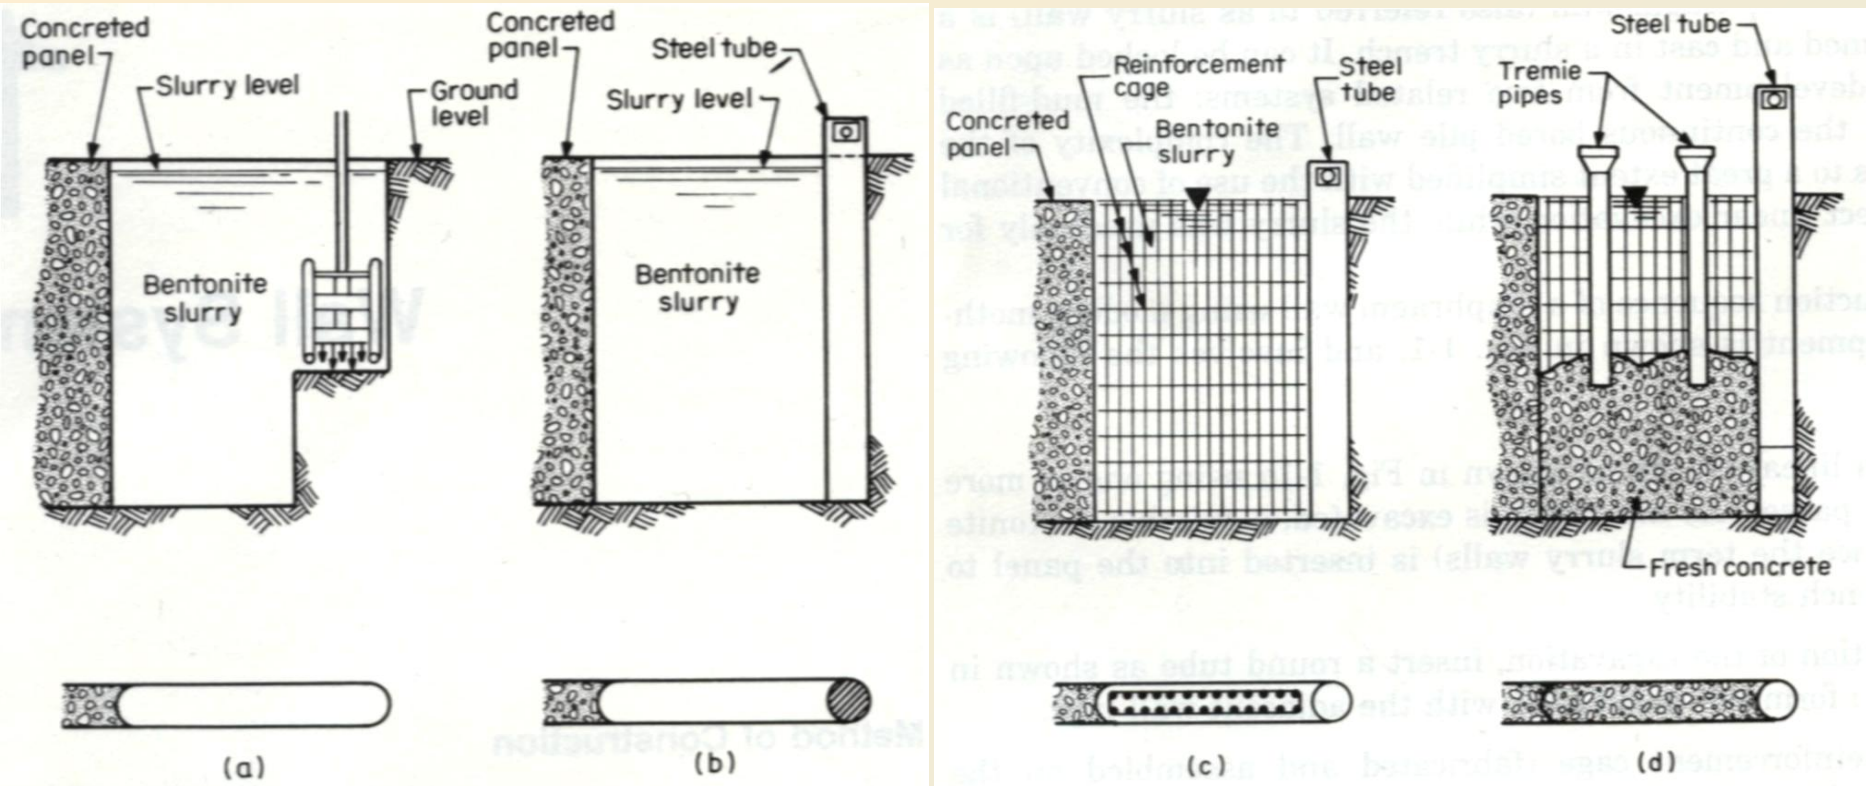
Typical construction sequence of a diaphragm wall, executed in four stages: (a) Excavation. (b) Insertion of steel tubing. (c) Placement of reinforcement cage. (d) Concrete placement.
